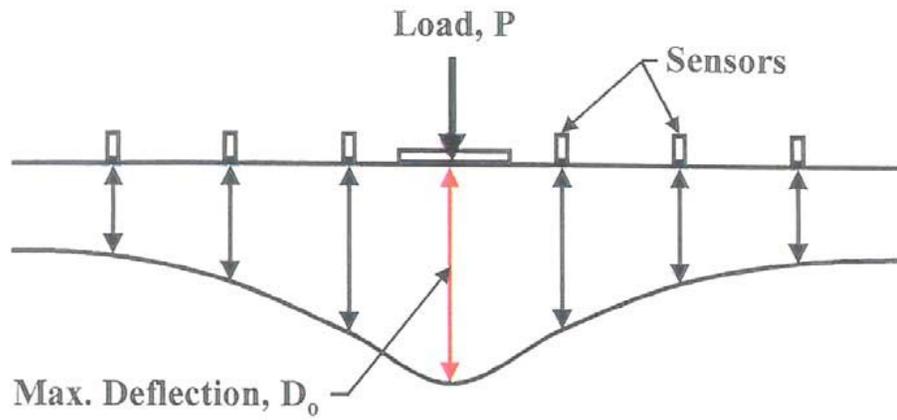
Falling Weight Deflectometer (FWD) Typical Pavement Deflection
